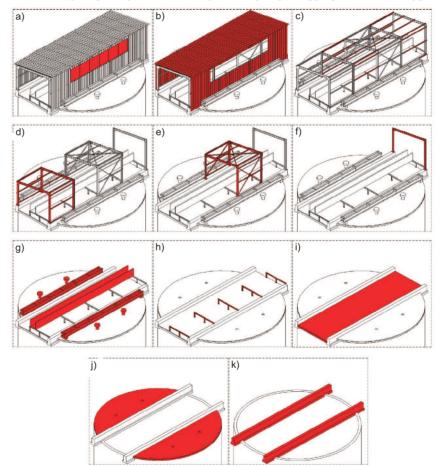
Gallery and silo ceiling disassembly steps (fill indicates item being disassembled): a) windows; b) trapezoidal sheeting; c) purlins and rafters; d) section 1 (4 columns, 2 rafters, 4 purlins and 6 wall rafters); e) section 2 (4 columns, 2 rafters, 4 purlins, 6 wall rafters, slope bracing and inter-pillar bracing); f) section 3 (2 columns, 1 rafter); g) ventilation equipment, equipment support beams, redler; h) redler substructure; i-i) chamber floor; k) floor beams
